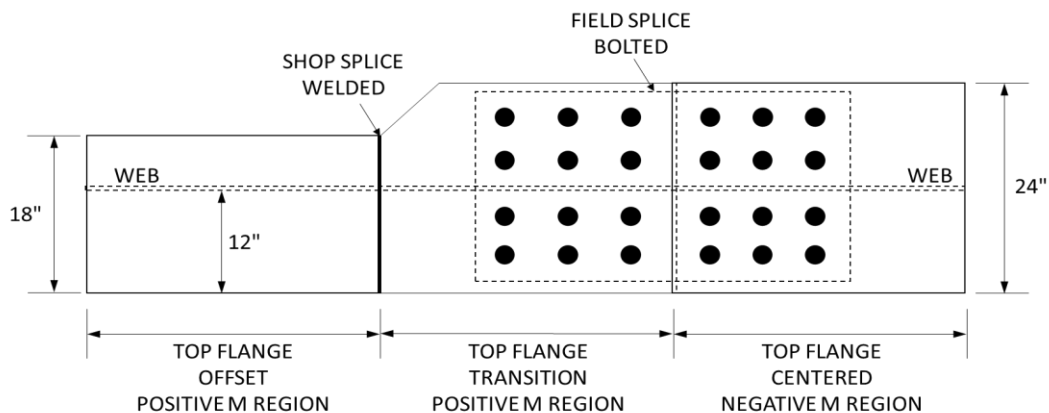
Splice Detail for Tub Girder with Flange Width Transition (Top View)
